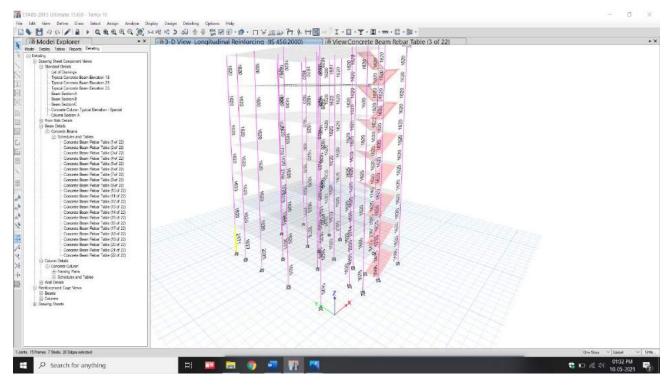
Reinforcement detail obtain from STAAD. Pro for Column
